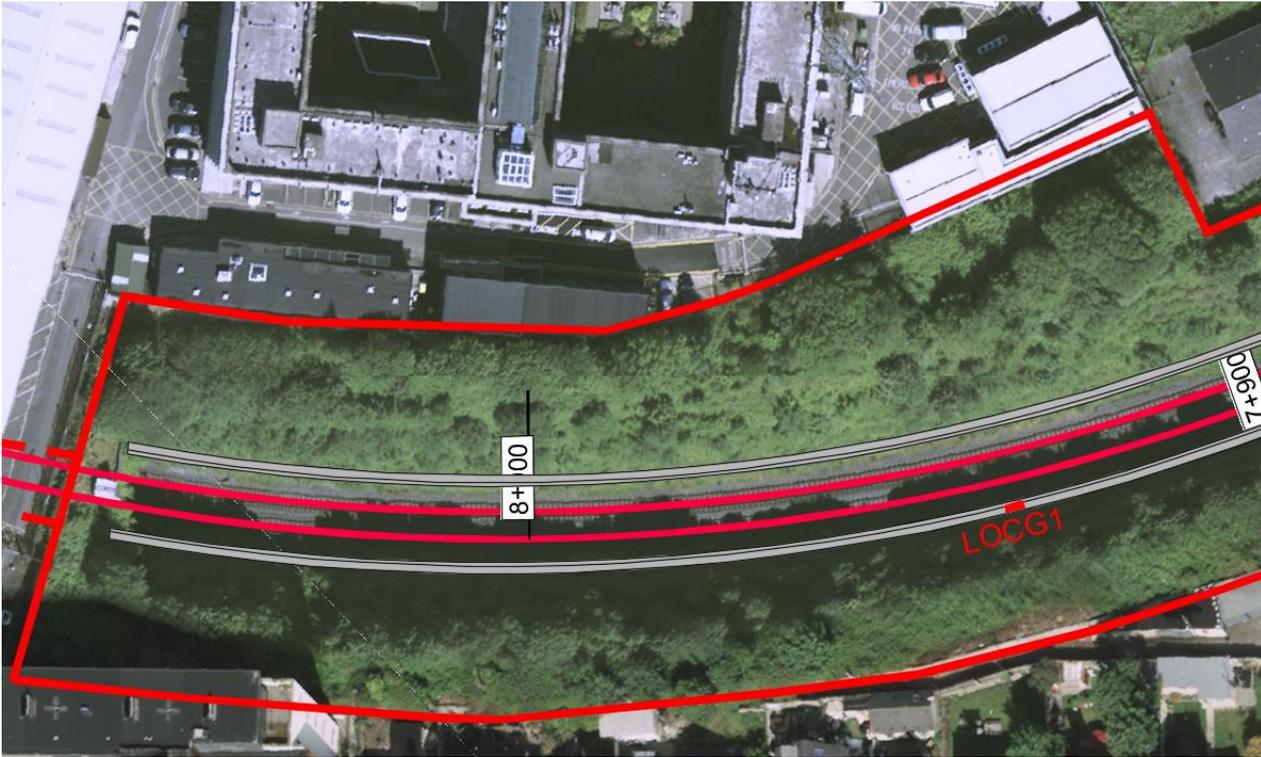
Signalling Infrastructure (North Entrance at Phoenix Park Tunnel)
